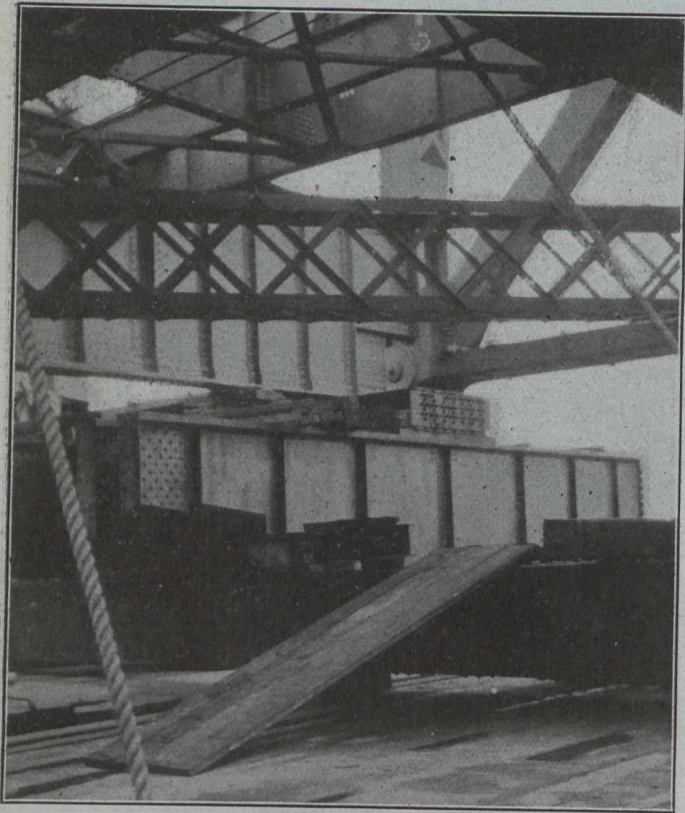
View from Floor of Scow While the Span Rested on End Bents, Showing Support for One of the Panel Points of the Bottom Chord, Stringers Under Panel Point Distributing the Load to Girders
